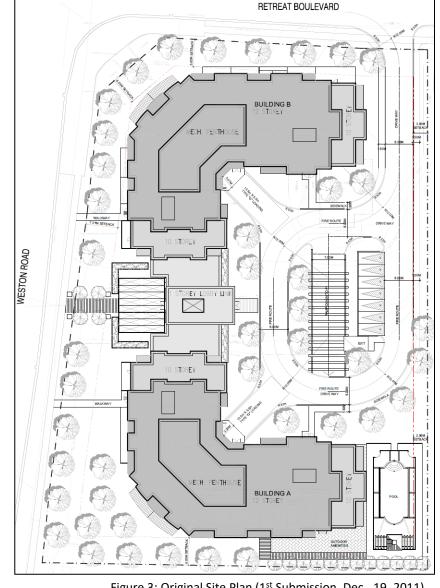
Original Site Plan (1st Submission, Dec., 19, 2011)
